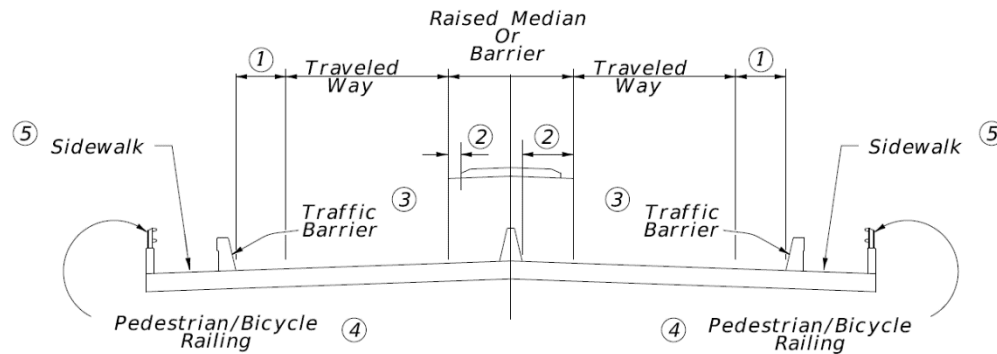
Bridge Section for Undivided Arterials and Collectors
